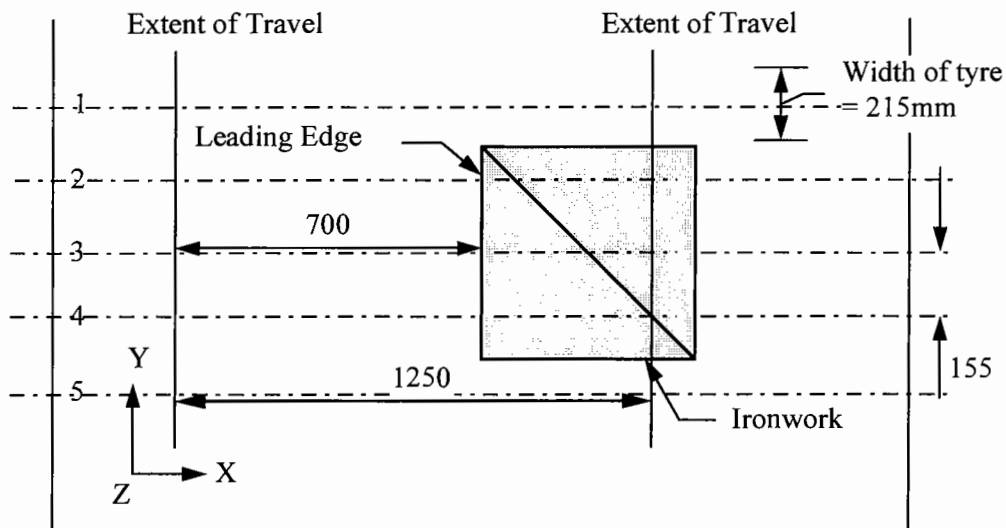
Plan view of a manhole installation indicating wheel paths
